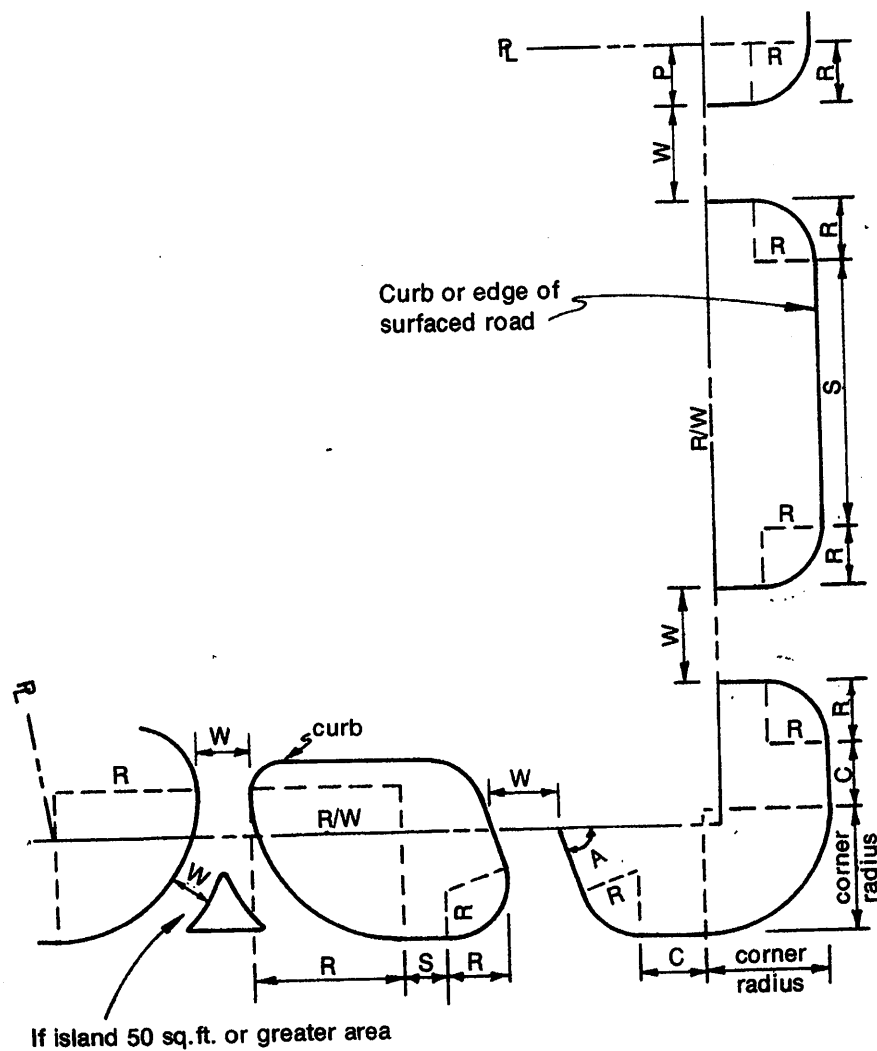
DRIVEWAY DIMENSION MEASUREMENTS
